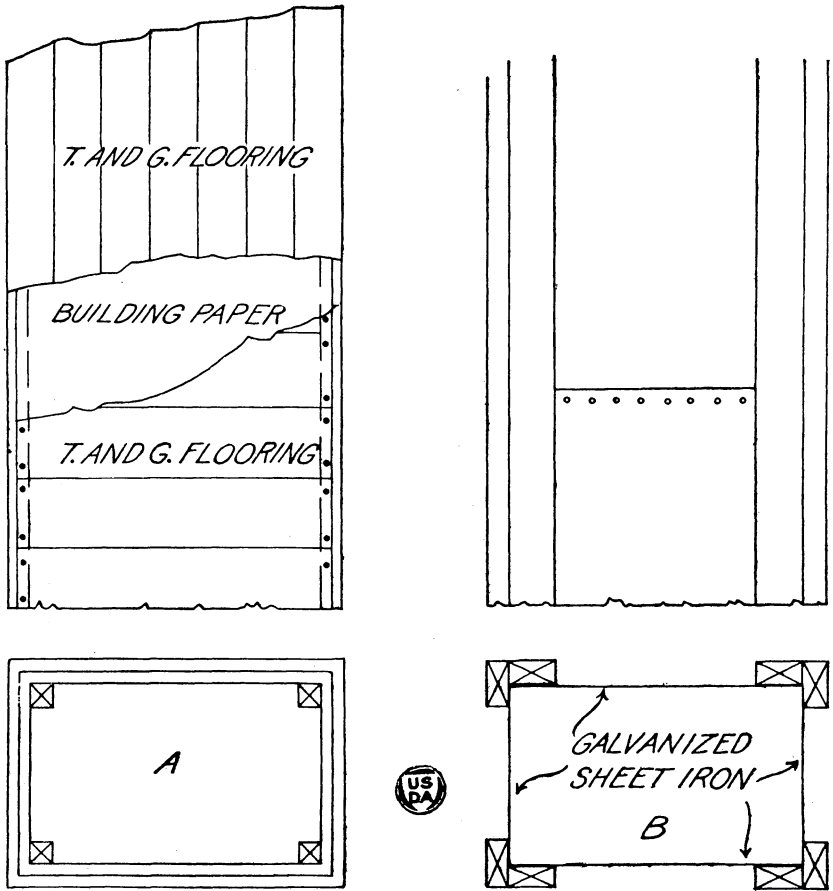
Details of outlet-flue construction: A, wood construction; B, galvanized-metal construction.
